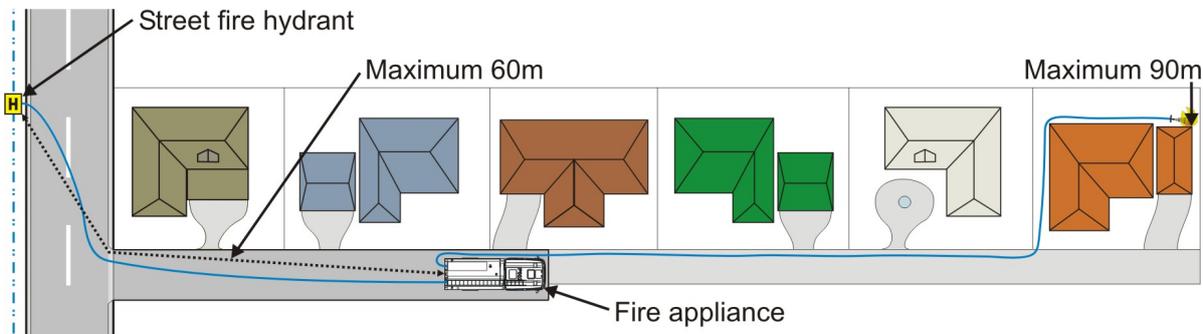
Example of street fire hydrant used by fire appliance on private carriageway
